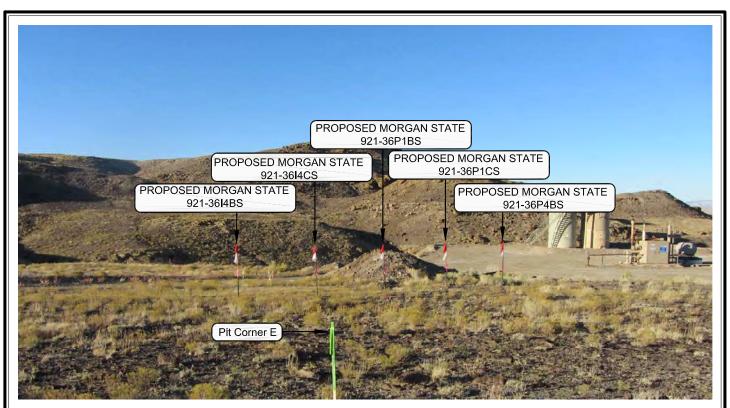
PHOTO VIEW: FROM PIT CORNER E TO LOCATION STAKE
